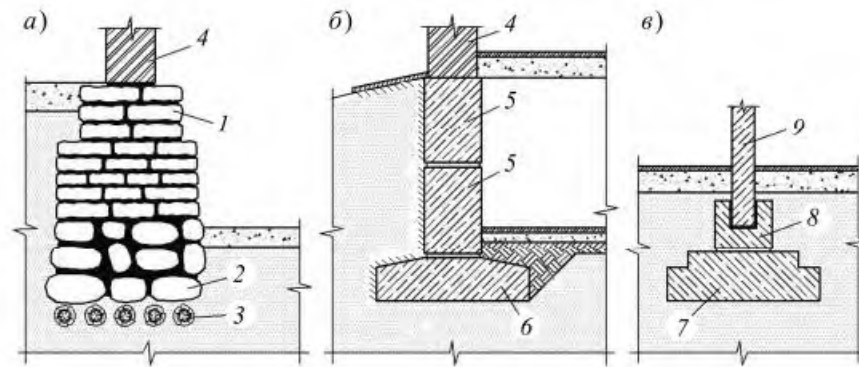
Cross-sections of typical shallow foundations: a – strip foundation of a load-bearing wall of a house, built from natural stone; b – precast reinforced concrete strip foundation of a large-panel house; c – precast-monolithic separate foundation for a column of an industrial building frame; 1 – natural stone masonry on lime mortar; 2 – boulders; 3 – sleepers; 4 – wall; 5 – wall blocks; 6 – cushion block; 7 – monolithic foundation; 8 – precast column sub-base; 9 – column [1]
